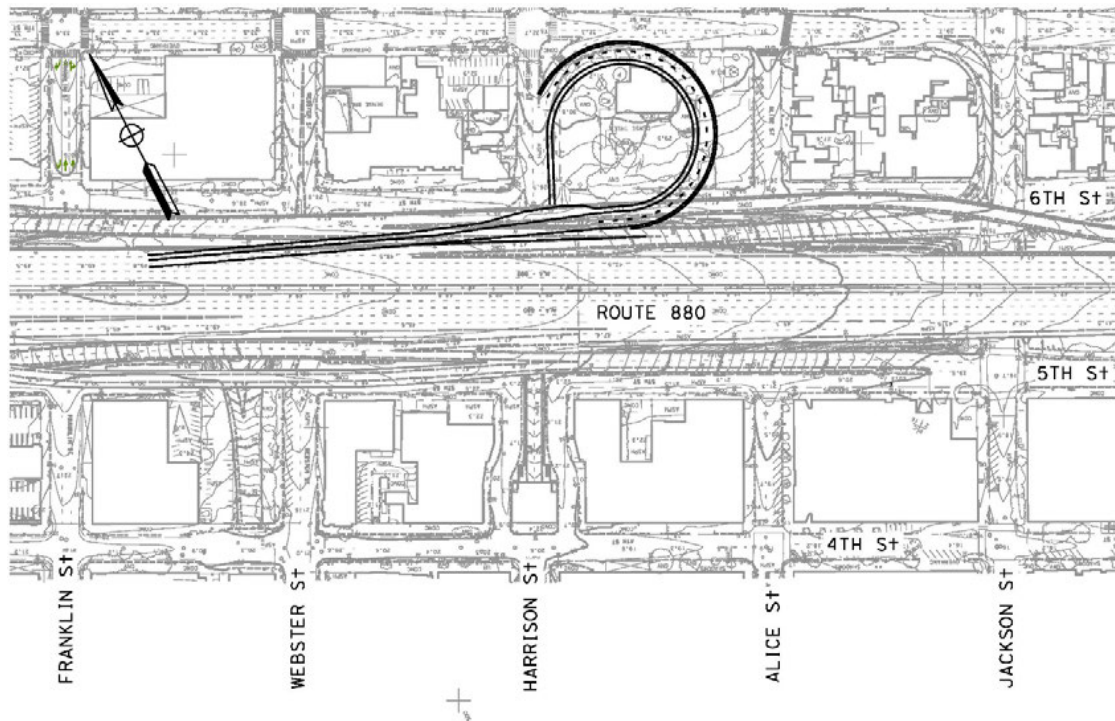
Posey Tube to I-880/I-980 Ramp without Braid
